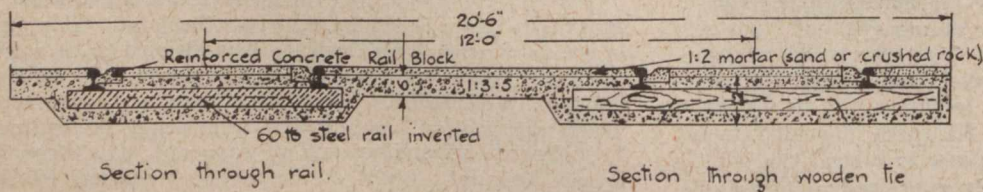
DESIGN FOR 1916 CONSTRUCTION
